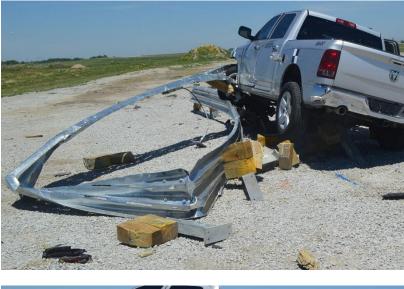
Damage to Rail at Post Nos. A1 through A3, Test No. MSPBN-7
